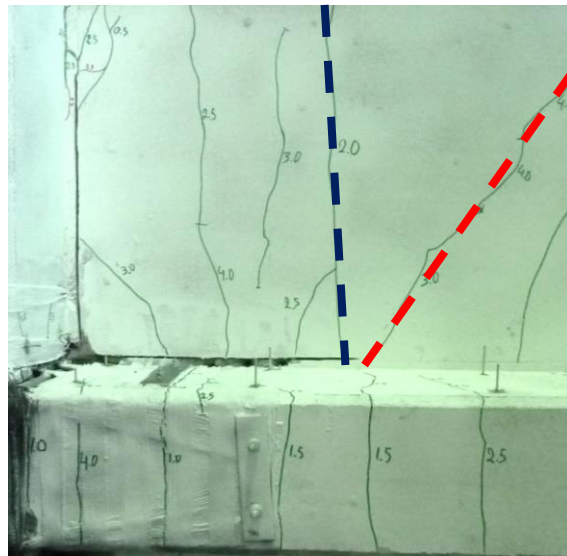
Observed cracks in the slab underside for specimen C1-RT-B-sw.
